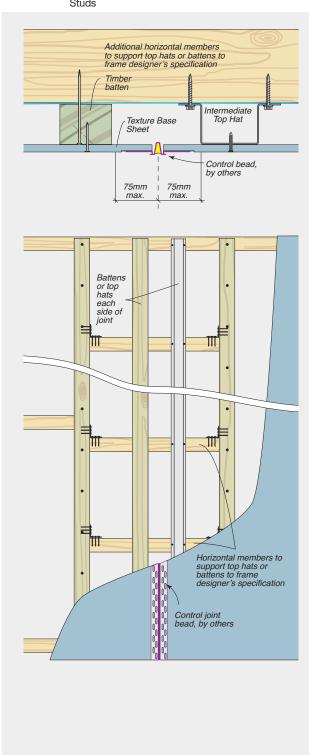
Control Joint Formed On studs – Structural Timber Batten
